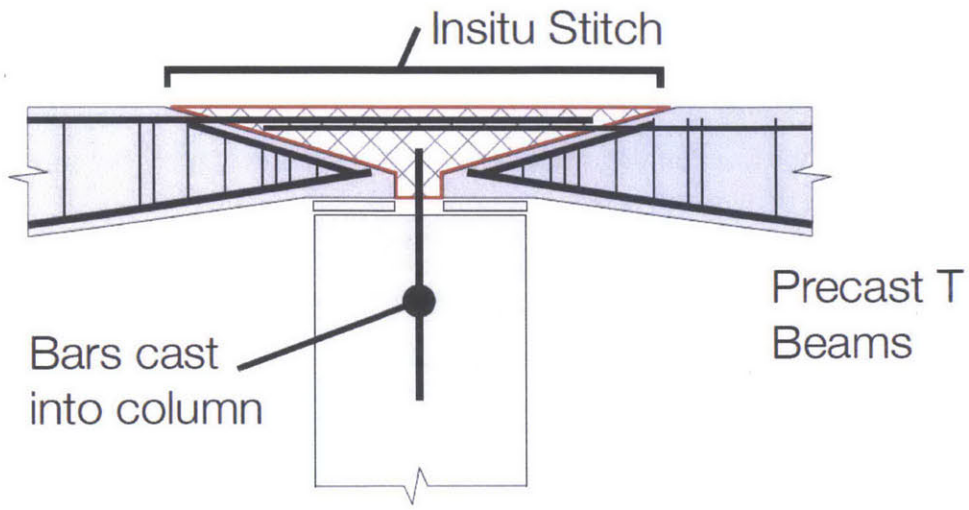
Picture taken from (Orr, 2012) which shows an insitu stitch of two precast concrete beams that meet on a column
